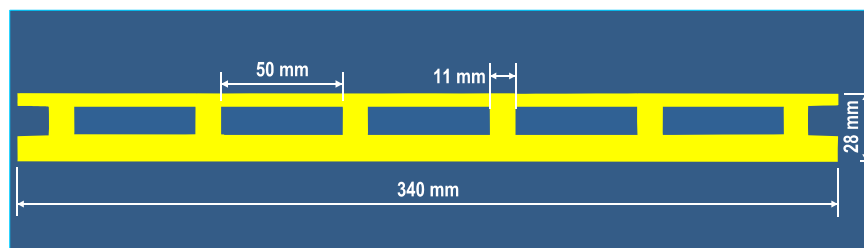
Diagram. Dimensions of the three-girder bridge deck.
